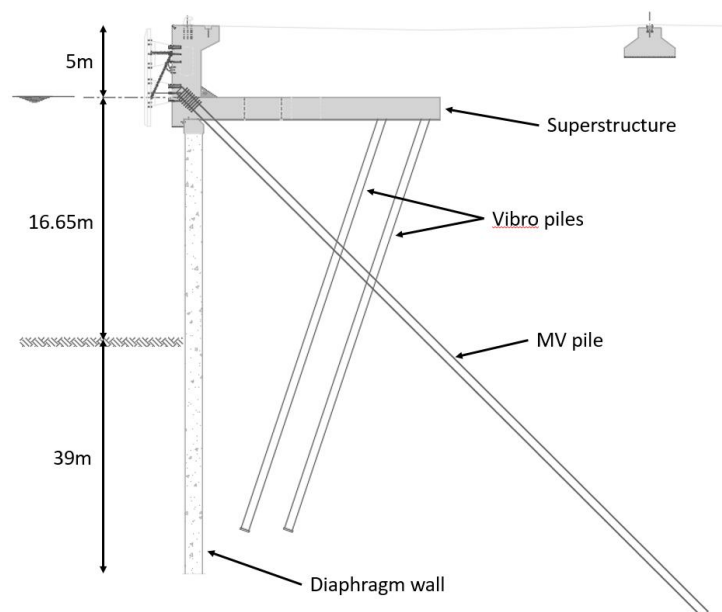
Cross-section of quay wall (adapted from Kuster (2007))
